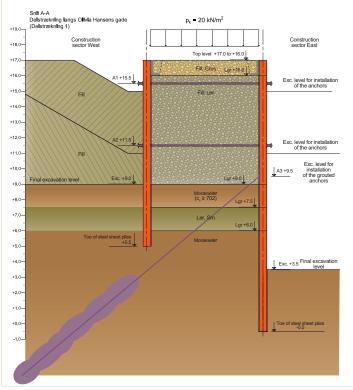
Cross section A-A of the retaining wall: several levels of anchors.
